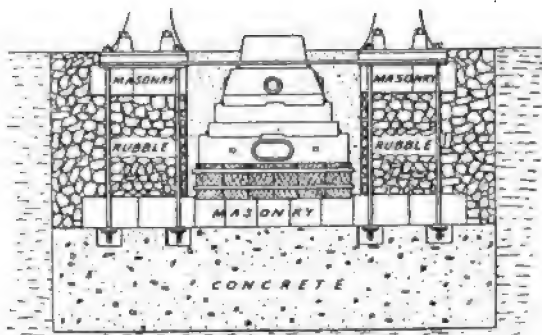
Anvil Block cast in Sections, supported on Timber, Masonry, and Concrete.
